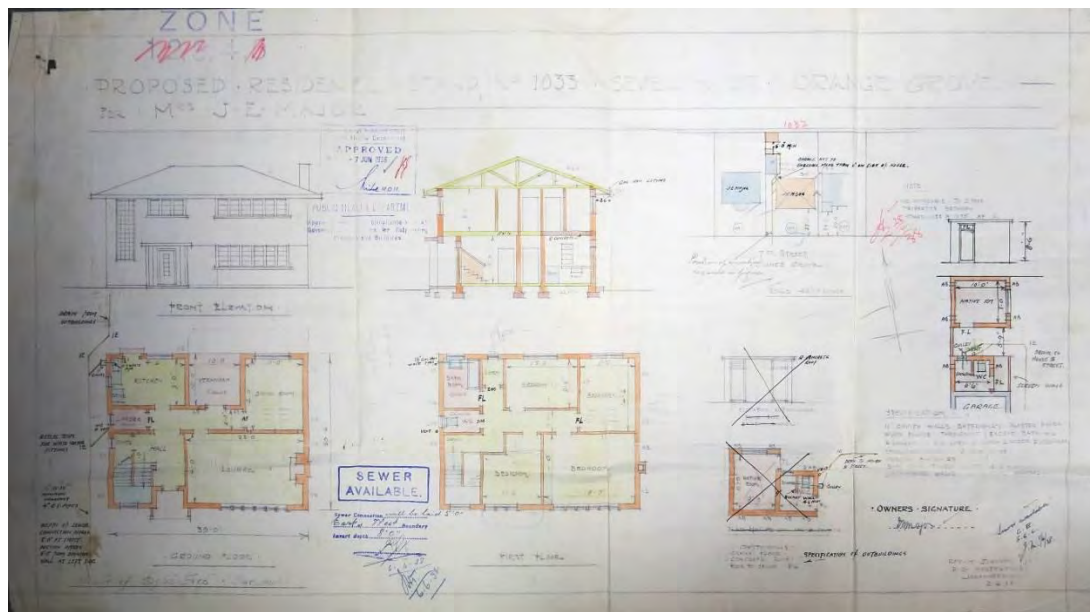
Plan for proposed residence on Stand 1033, Orange Grove from 1938
